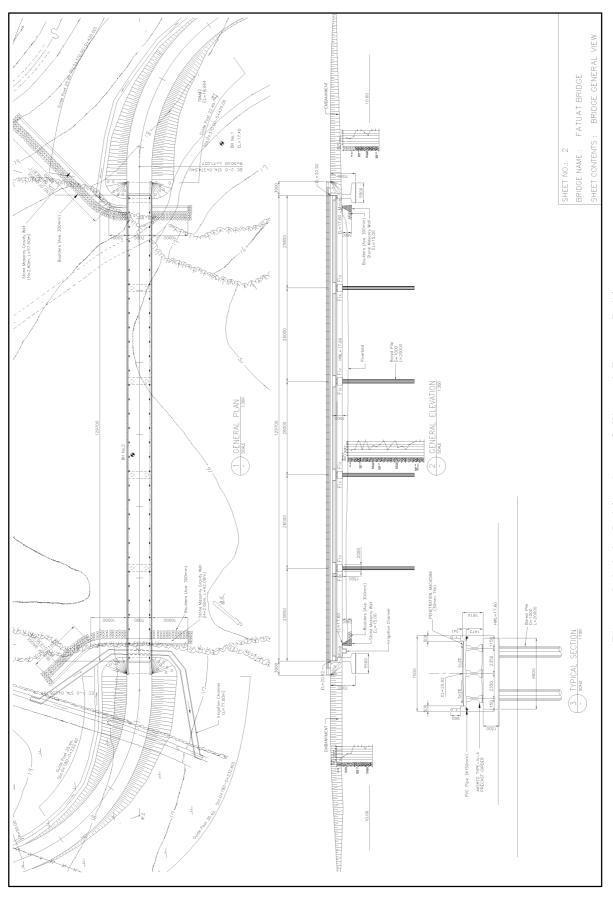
Bridge General View of Fatuat Bridge
